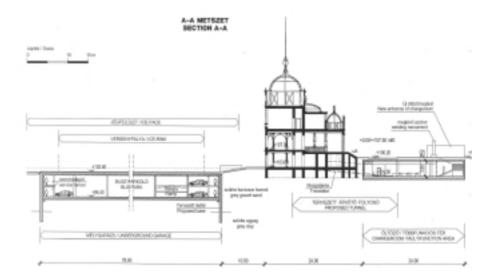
Section of the main building with the underground changing room/multifunctional space and the underground parking
